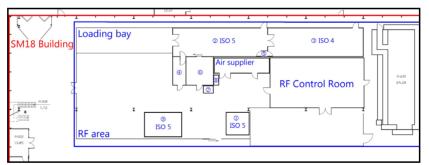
SM18 top view, delimited in blue the new cleanroom space as proposed in the last refurbishment plan (①softwall cleanroom, ②preparing area, ③assembling room, ④personal access, ⑤air shower, ⑥cleaning and rinsing space, ⑦ultra pure water production, ⑧high pressure rinsing, ⑨softwall cleanroom).
